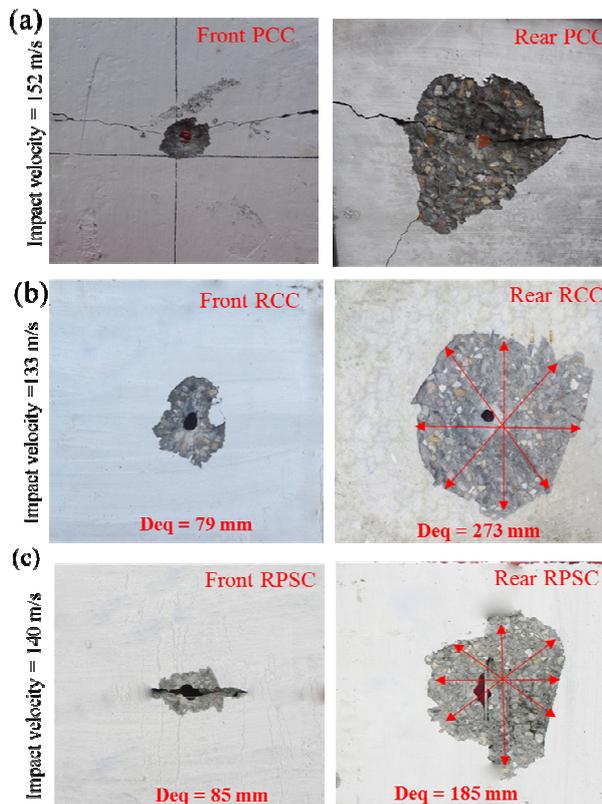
Tested specimens of 80 mm thickness (a) plain (b) reinforced and (c) prestressed concrete
